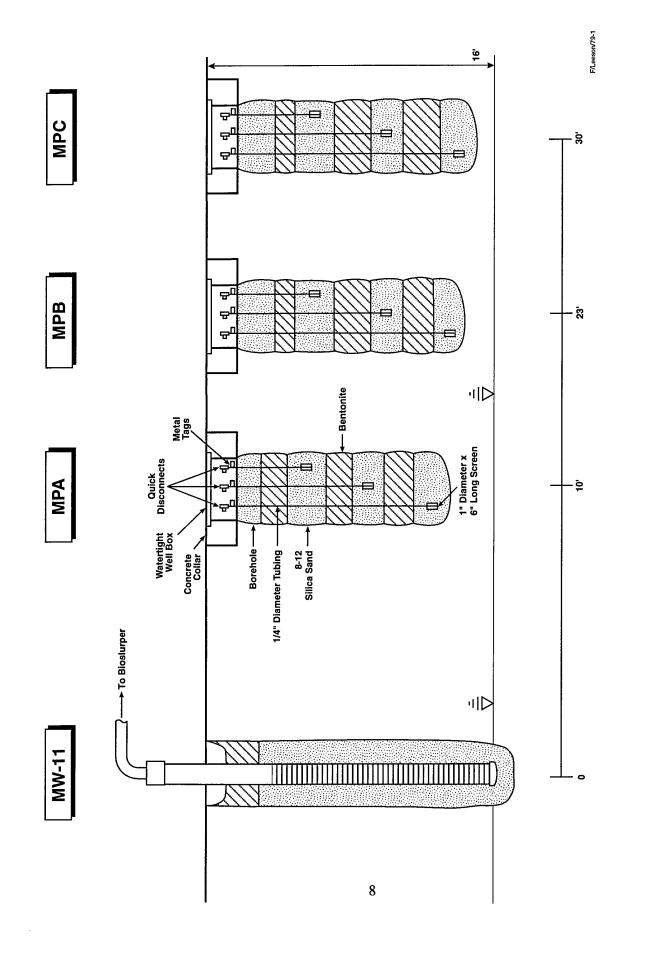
Schematic Diagram Showing Construction Details of Monitoring Well MW-11 and Soil Gas Monitoring Points
